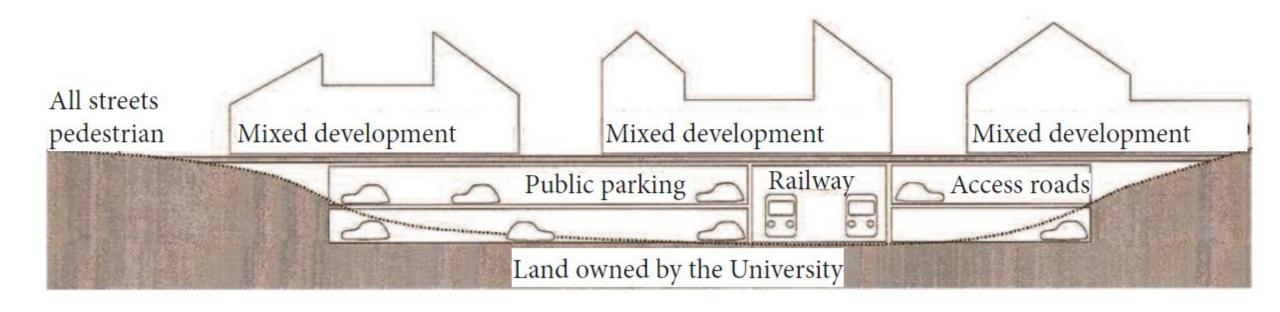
Development diagramme 1975 central platform. Underground railway station and access roads, including parkings.
